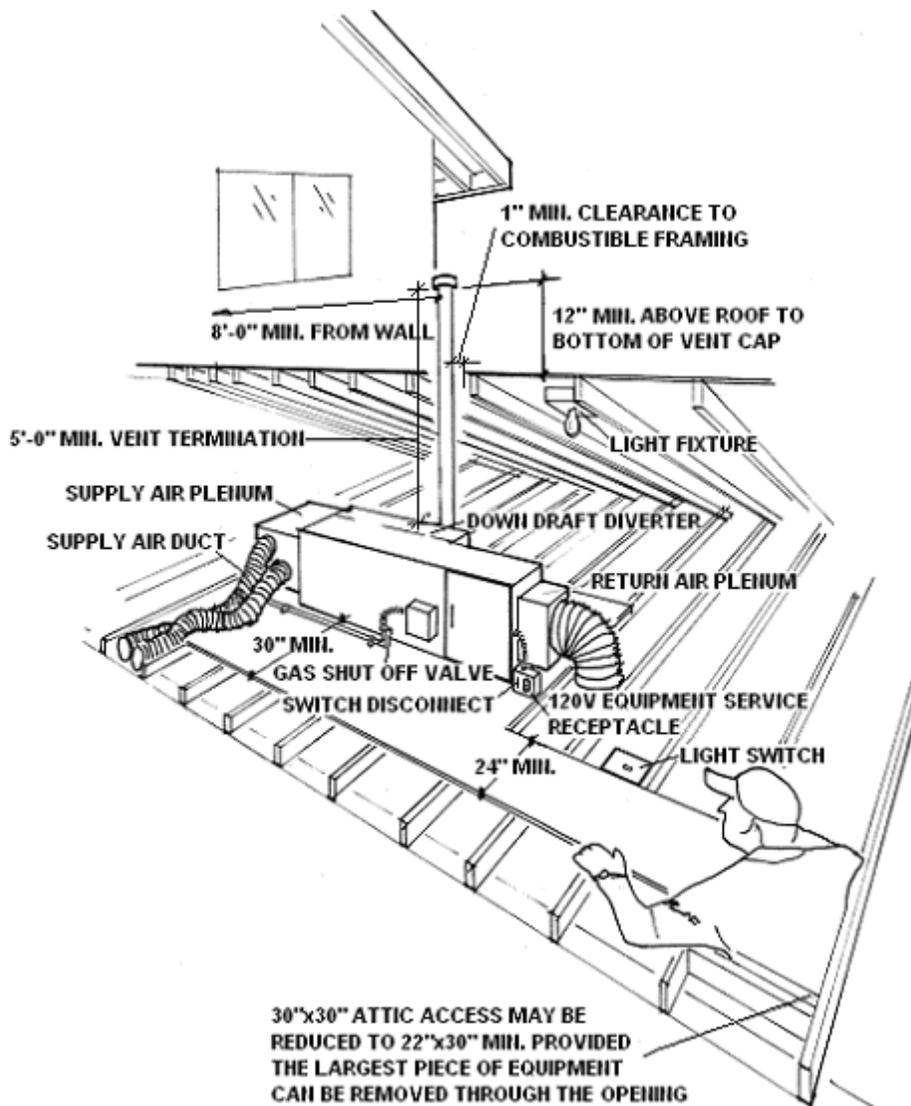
Typical Installation of Forced Air Unit in Residential Project
